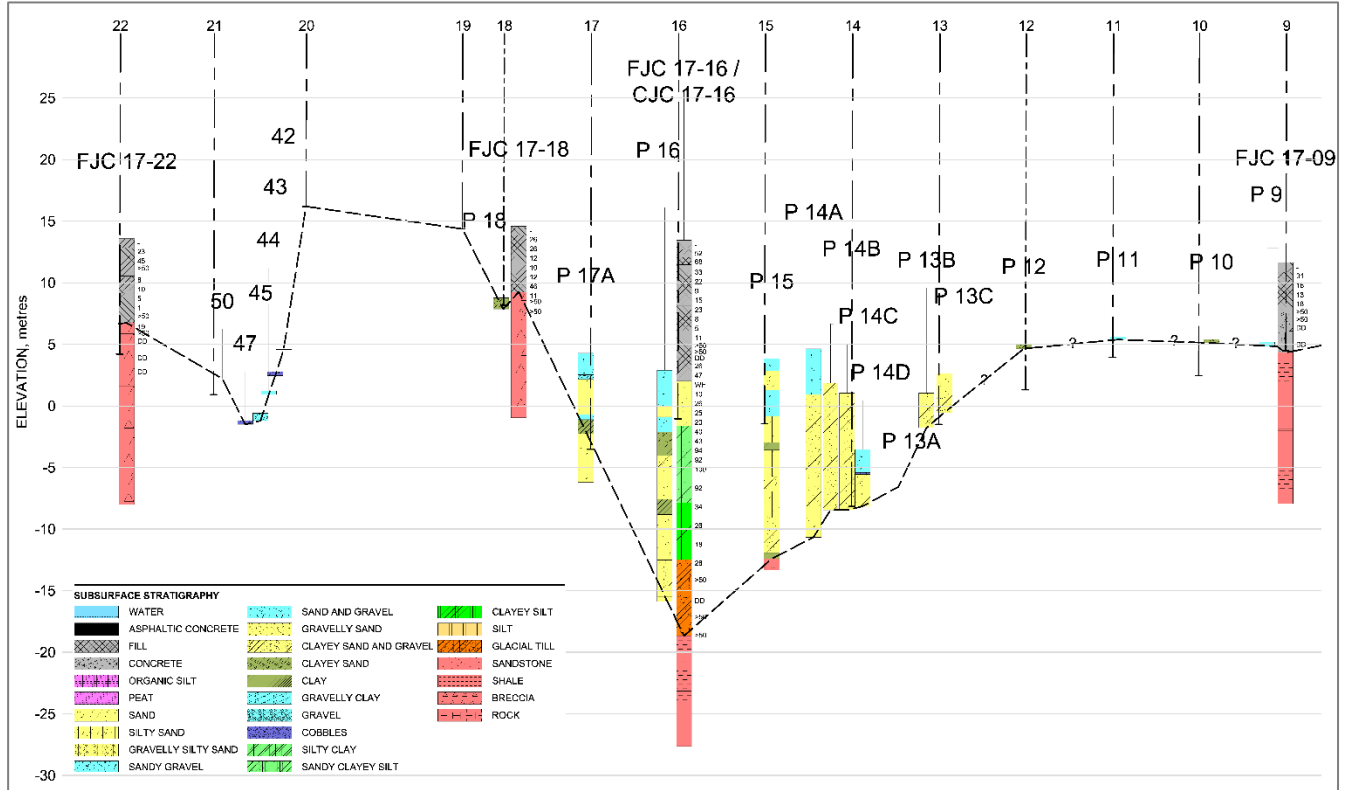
Cross-Section from piers 9 to 22 between Longueuil and St. Helen's island.
